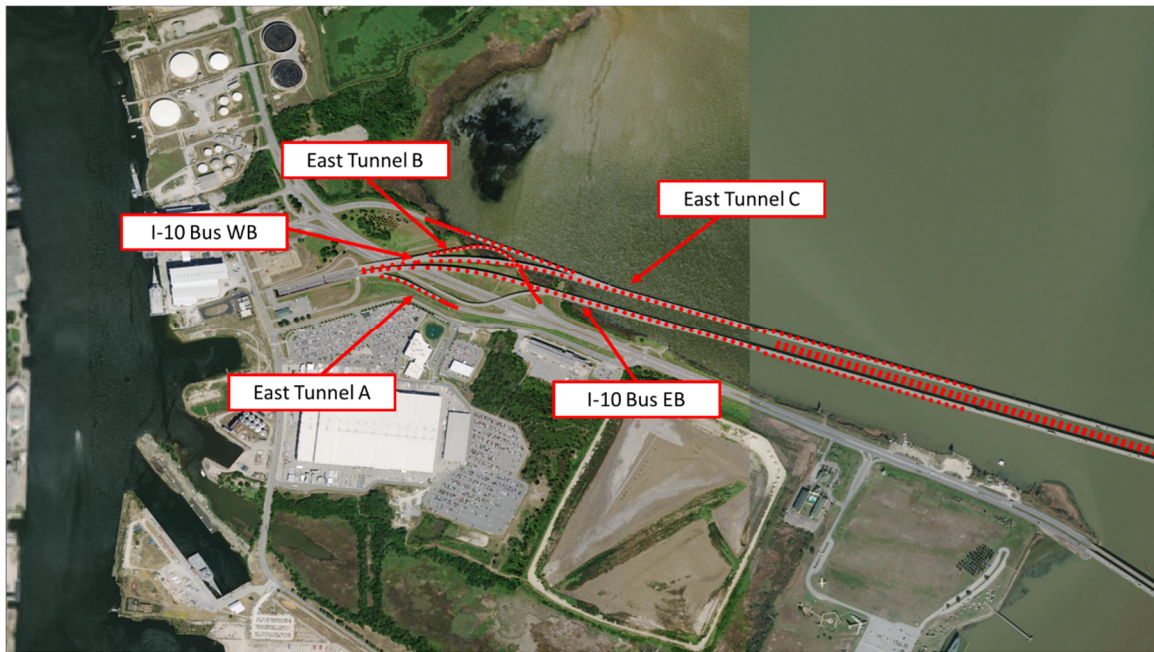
Proposed Bridge: East Tunnel and I-10 Business ramps
